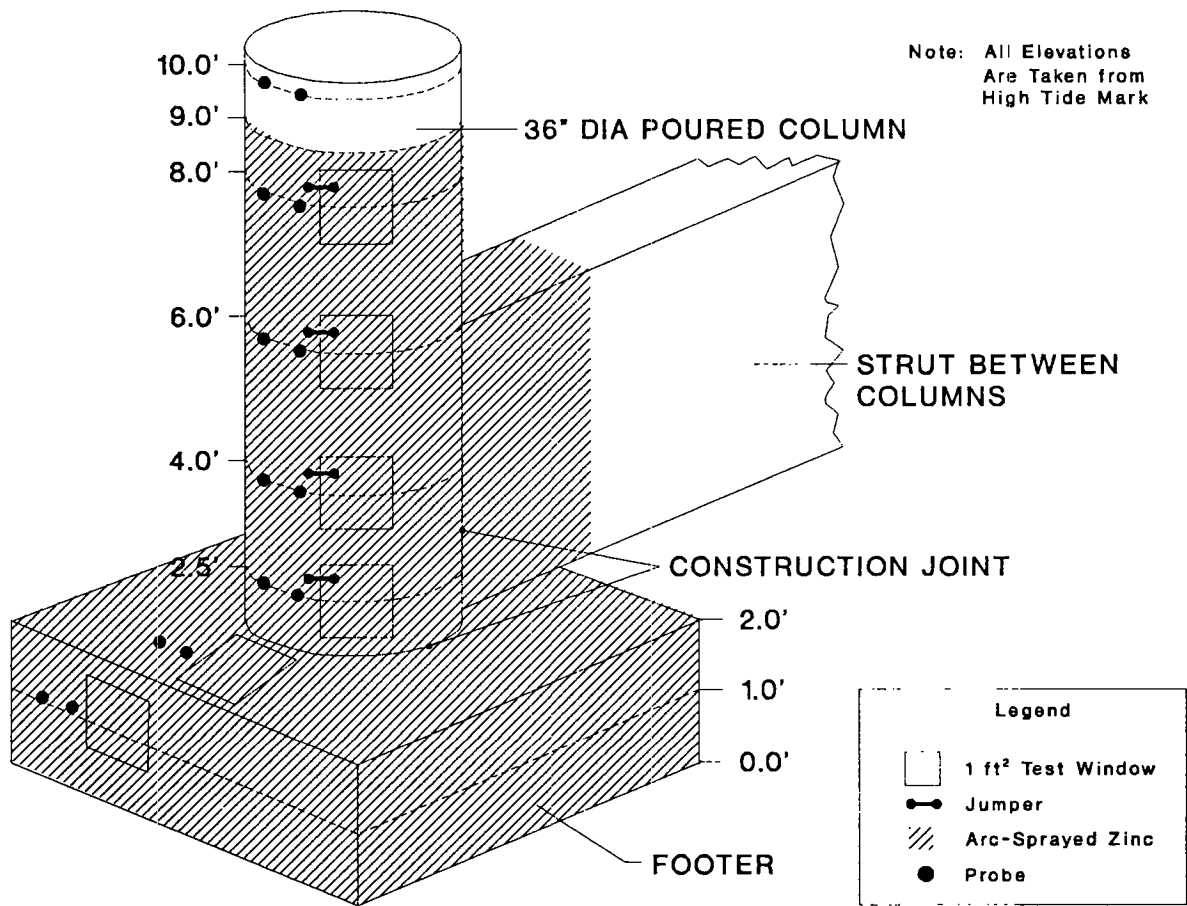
Schematic of test site at Bahia Honda Bridge (1 in. = 2.54 cm; 1 ft = 30.5 cm)
